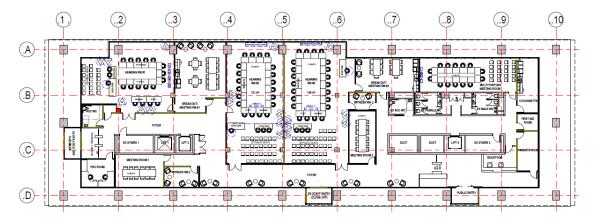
Previous floor plan option enclosing five pillars on the east elevation Source: Parliament of Victoria; Department of Parliamentary Services
